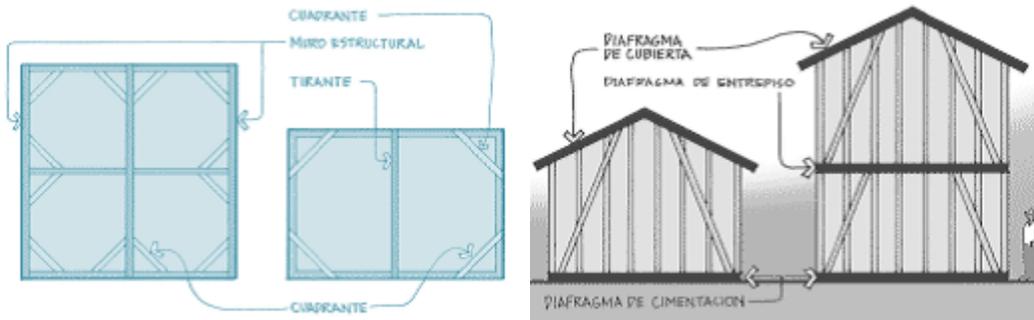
Typical bracing recommended on one and two story structures (AIS,2001).
